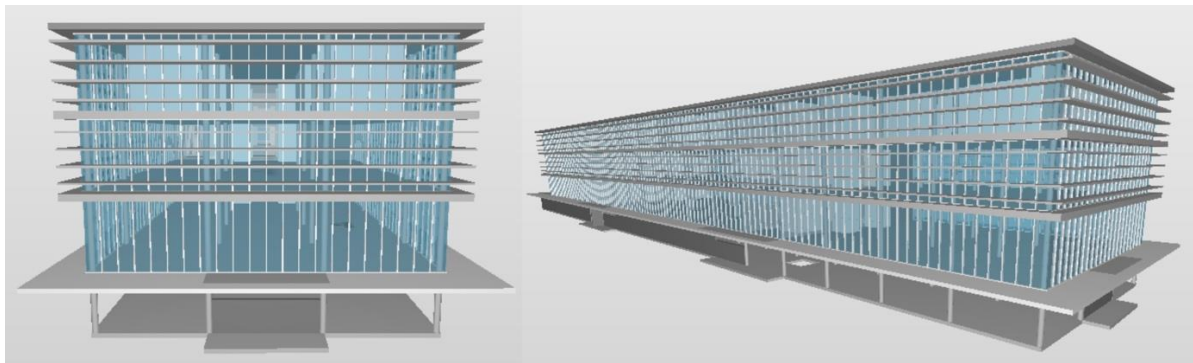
East facade view (left) and North/East facade view of the office building IFC model.
